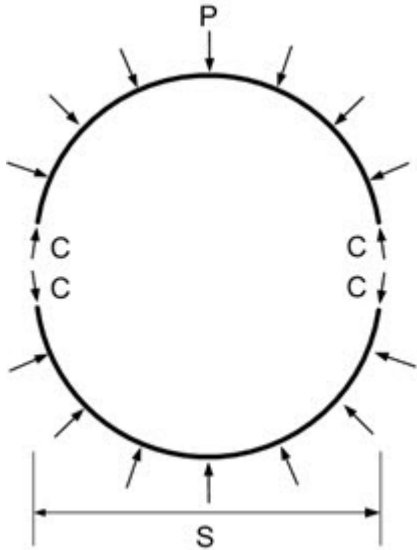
Flexible Culvert – Load vs. Shape
